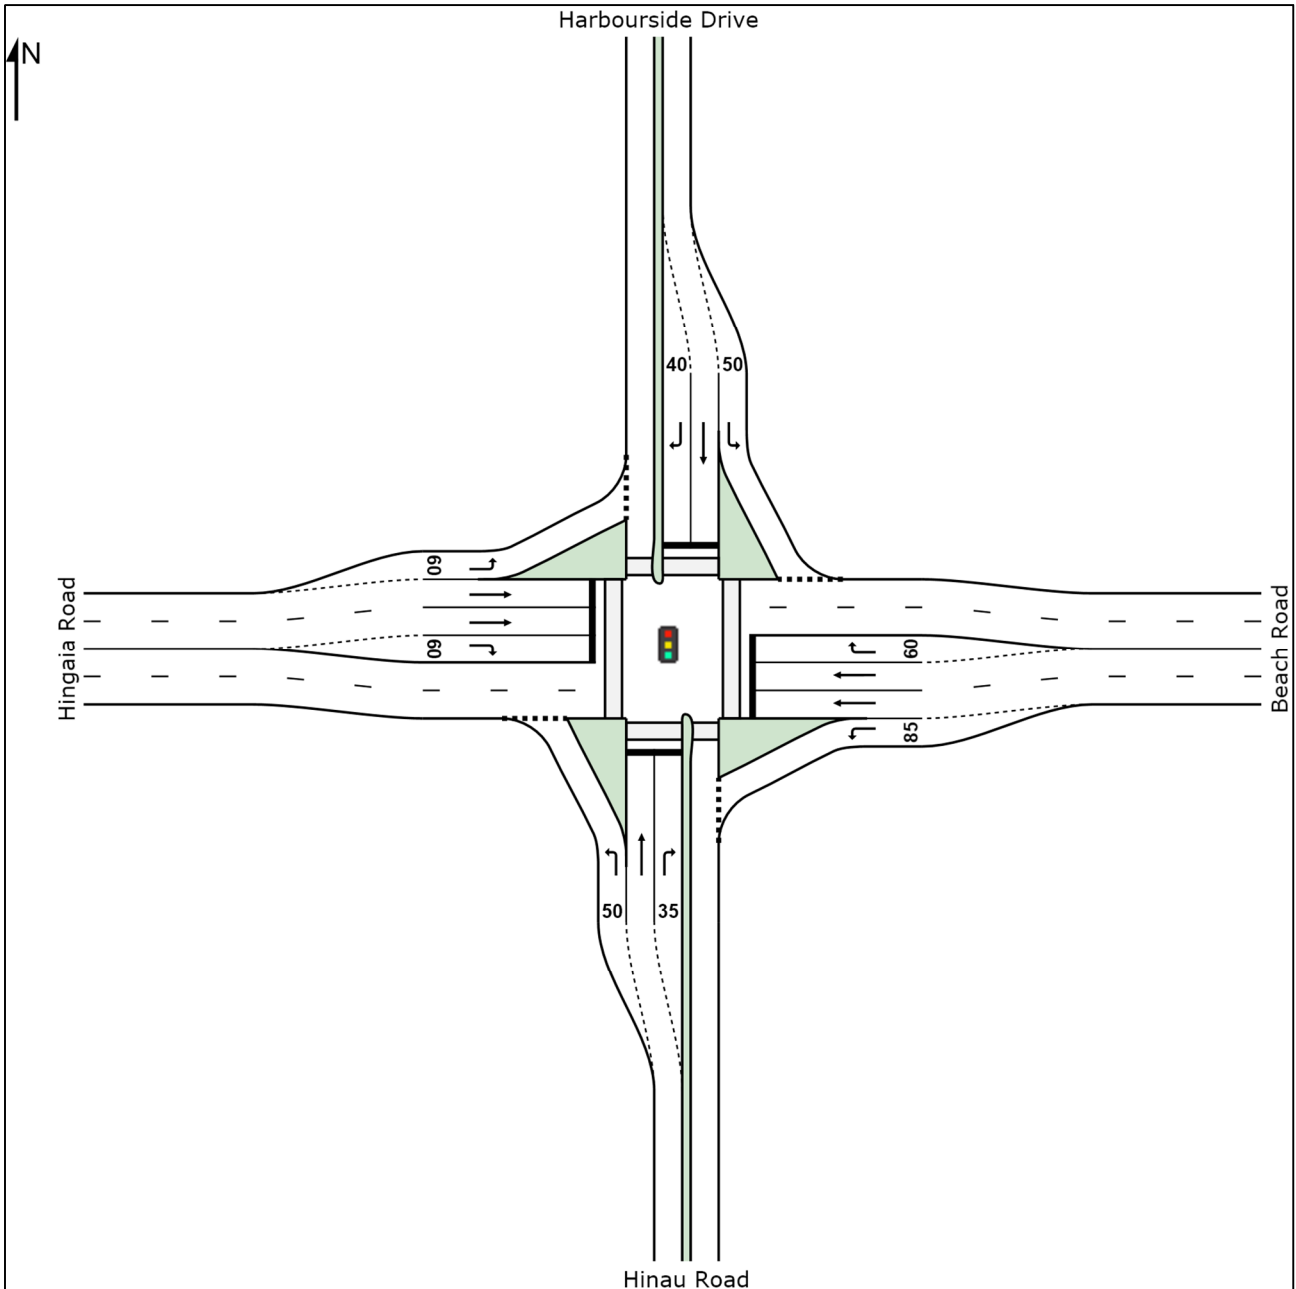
Hingaia Road / Harbourside Drive Existing Layout
